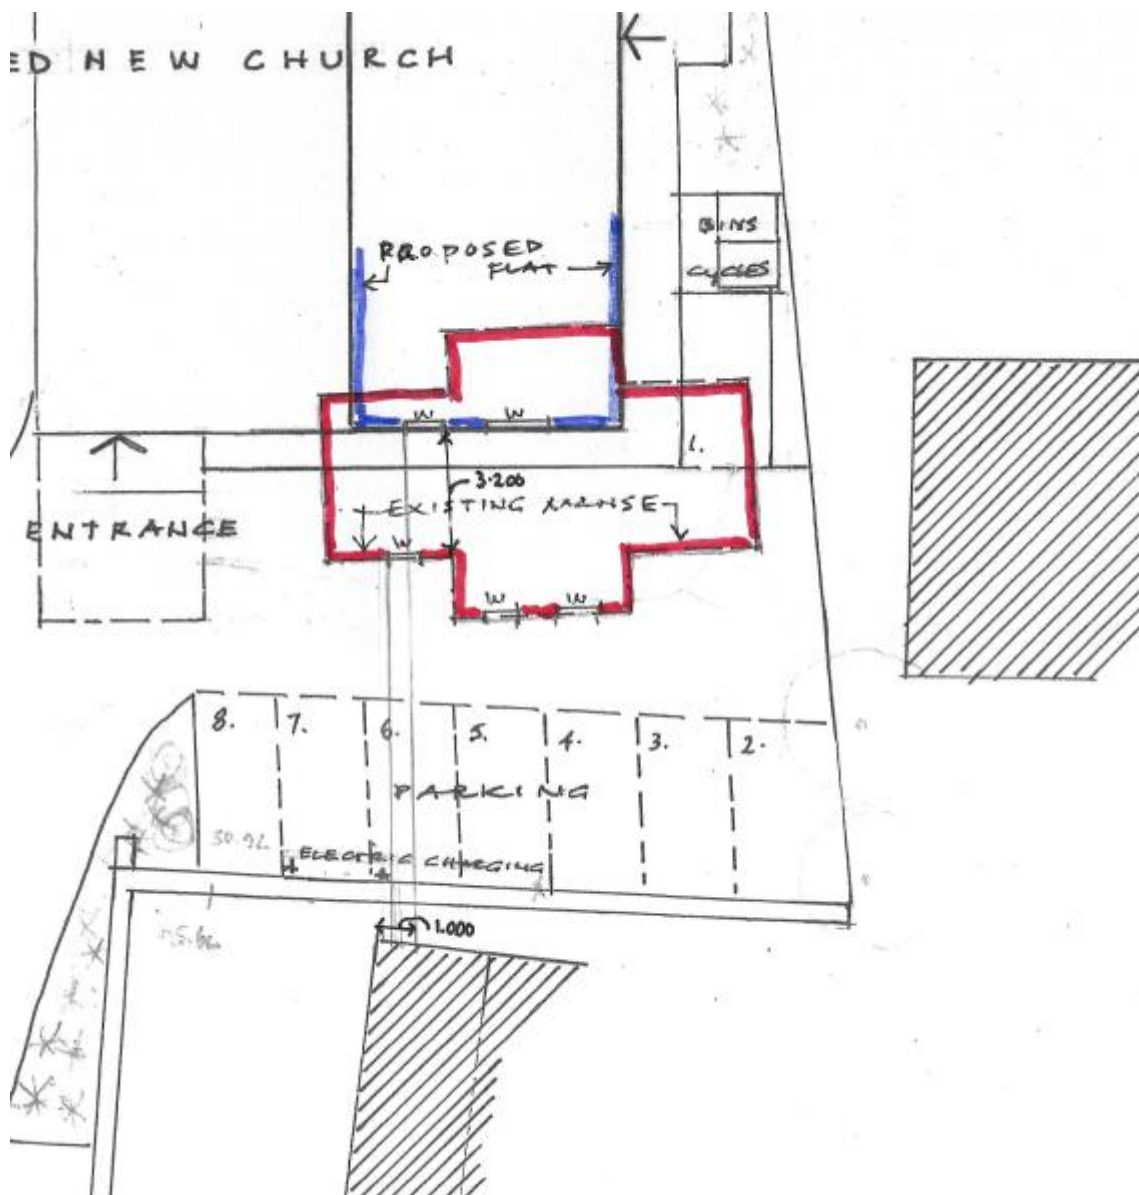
relationship between first floor windows in the existing Manse and proposed flat with No. 28 Chaveywell Court to the south.
